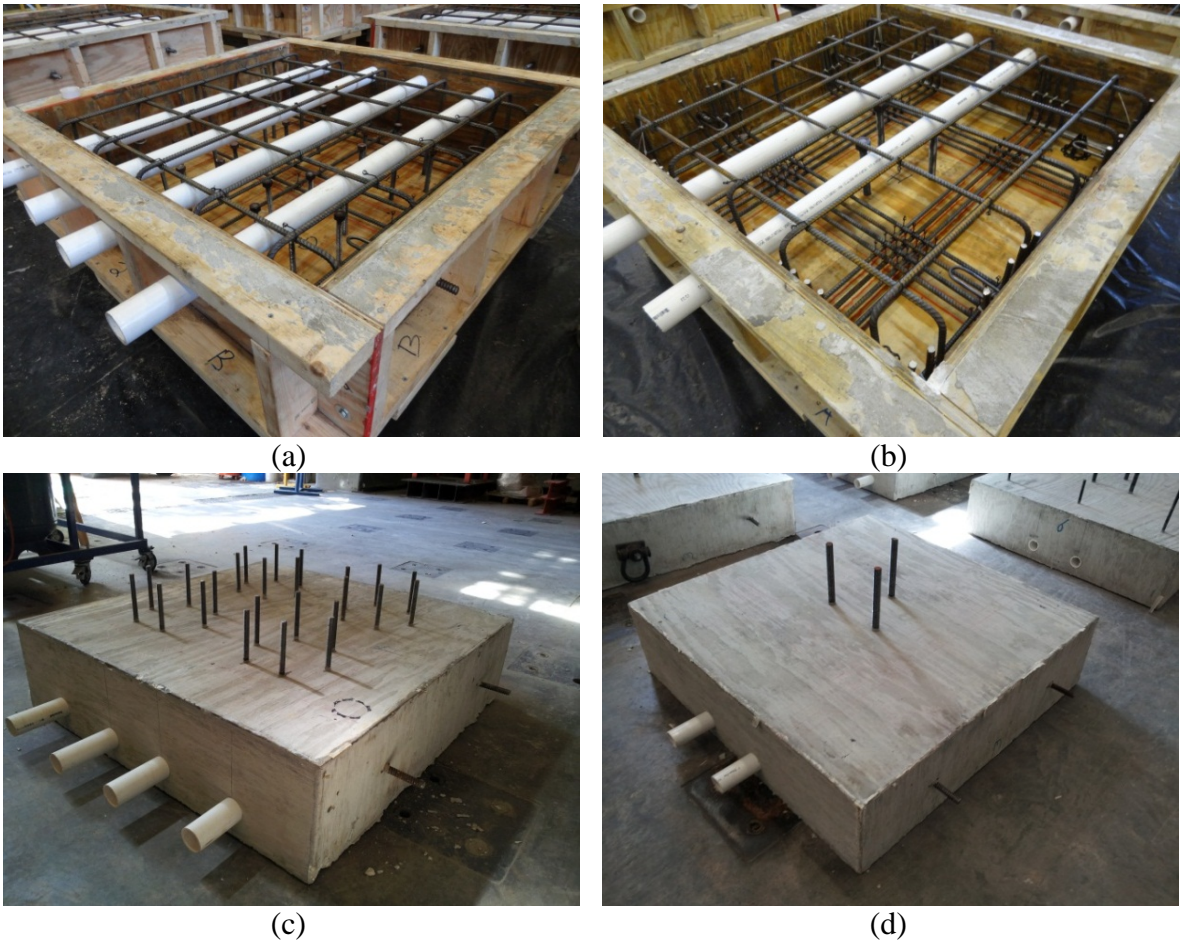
Reinforcement and completed blocks for 5/8 in. (a, c) and 1 in. (b, d) specimens
